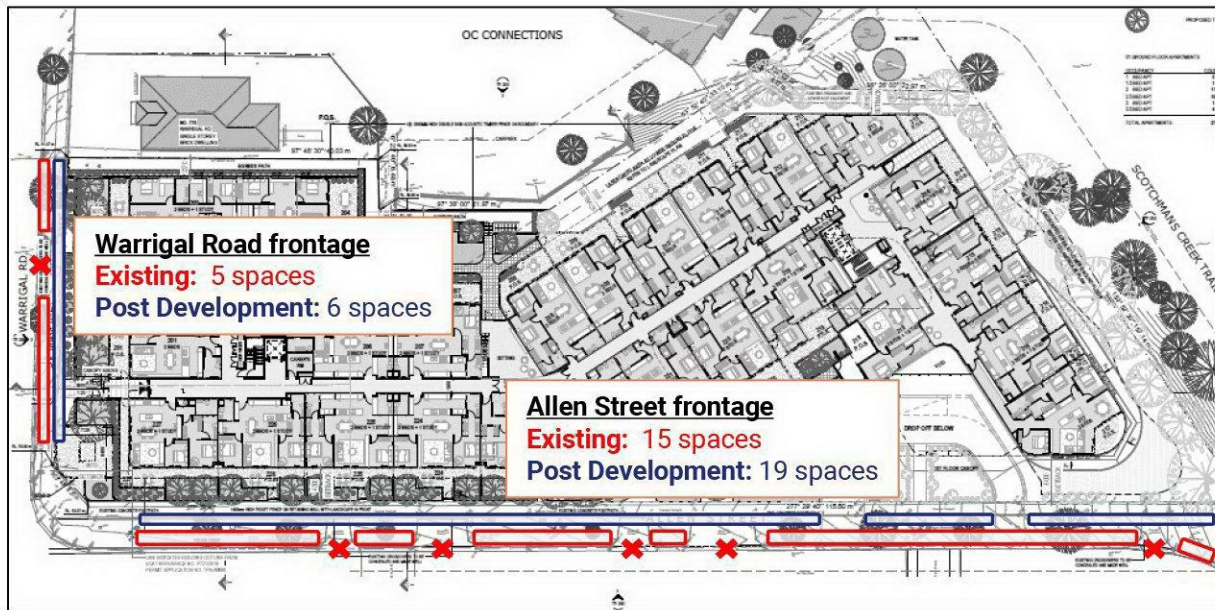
Proposed Crossover Closures & On-street Parking Changes
